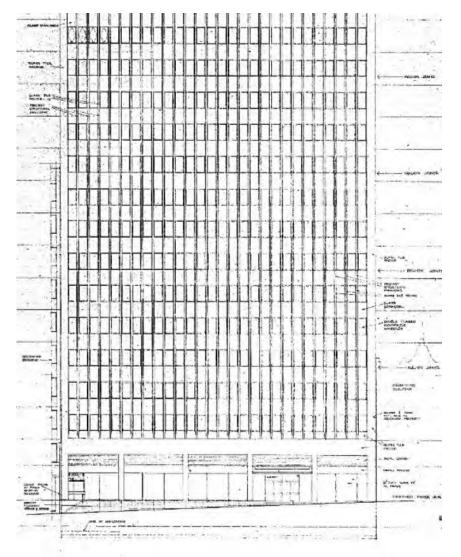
Architectural drawing of the south elevation to Collins Street, dated 1968 (BAP).
